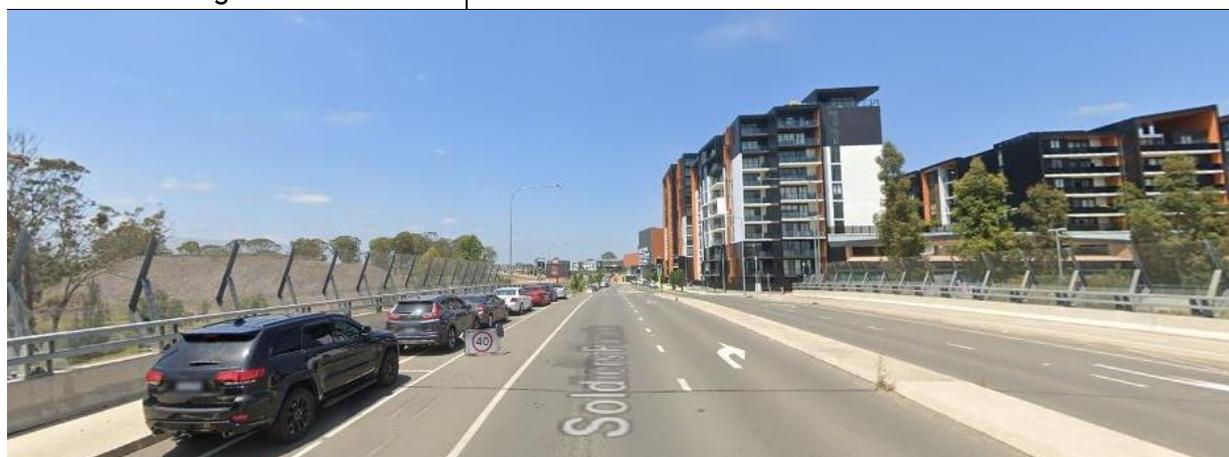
Soldiers Parade – Southbound towards Campbelltown Road
